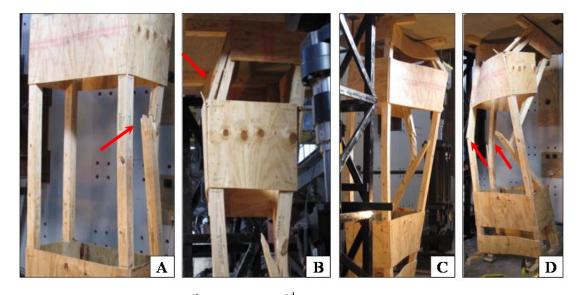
Failures A) 1st Failure B) 2nd Failure C) Excessive Torsional Buckling of Braces, Excessive Deflection D) Final Failure of Left Posts
